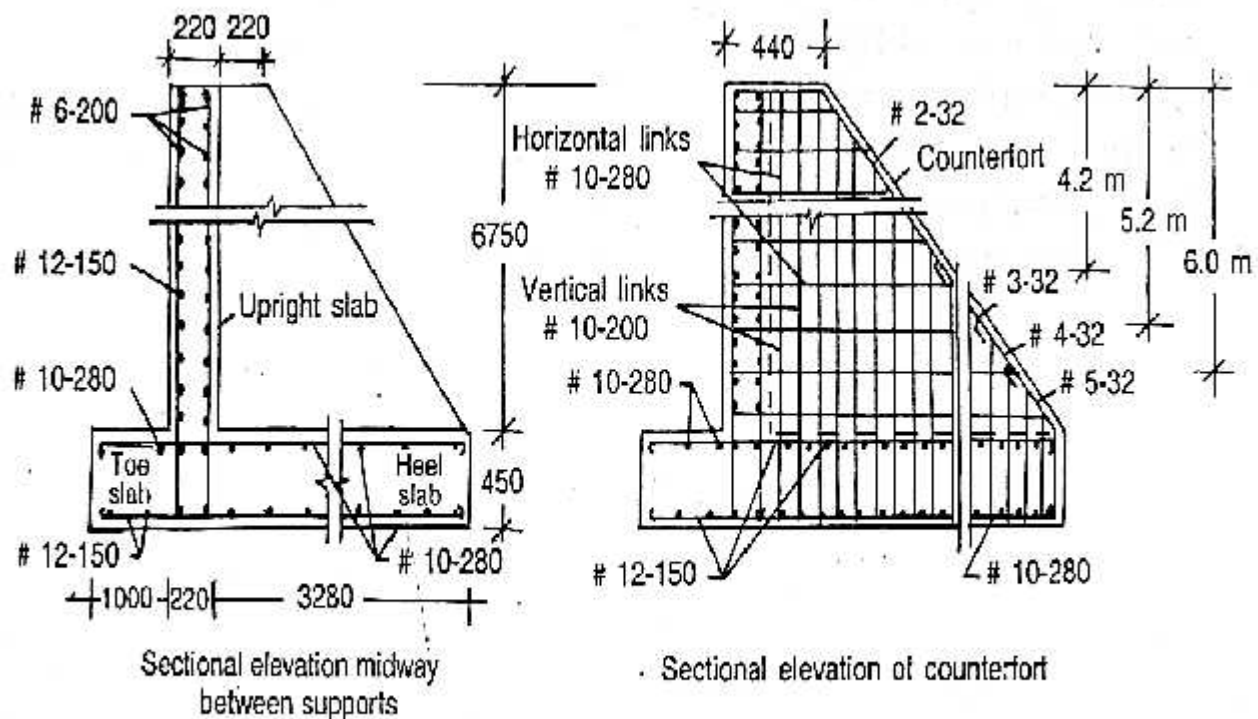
Reinforcement details in counterfort retaining wall.
